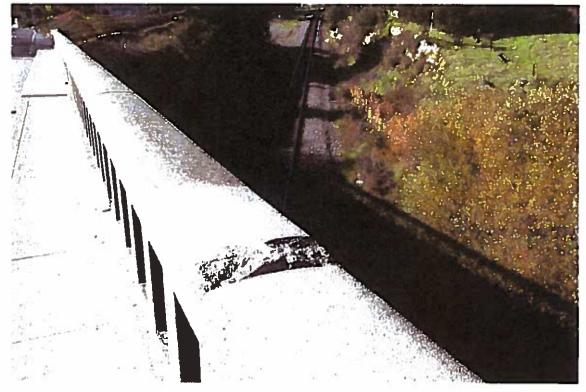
Spall in the top of the right RC bridge rail.
